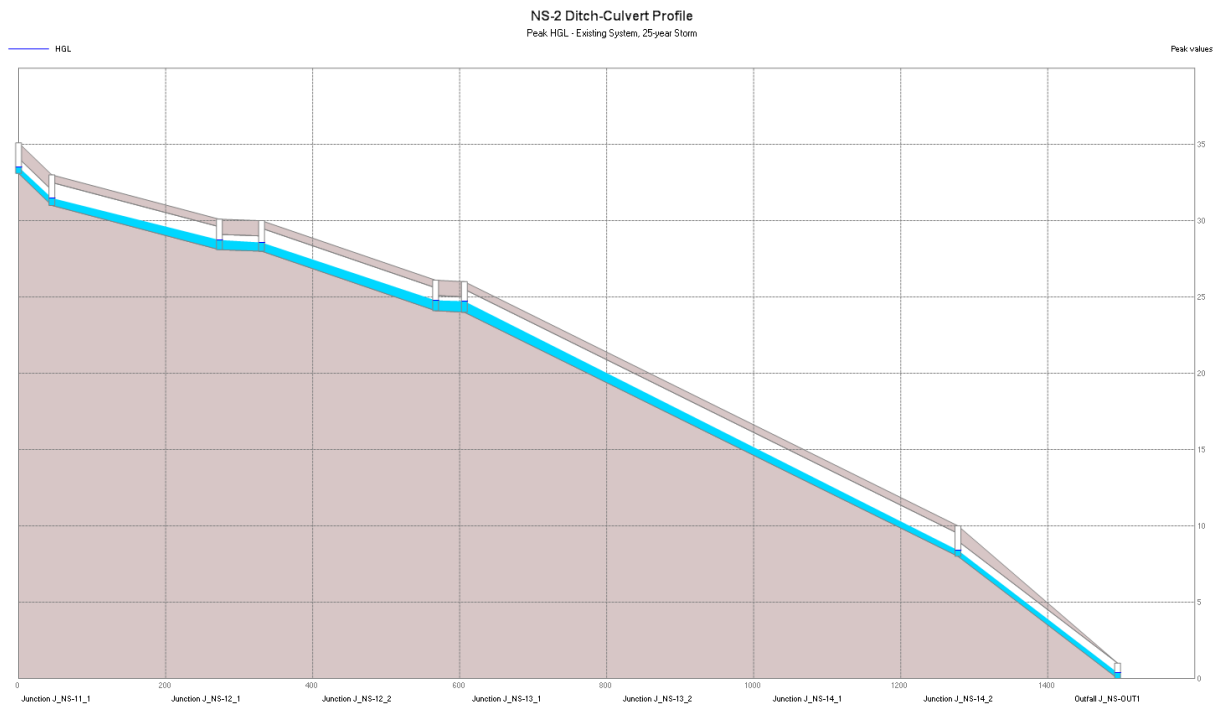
NS-2 Ditch & Culvert System Profile – Existing Conditions
